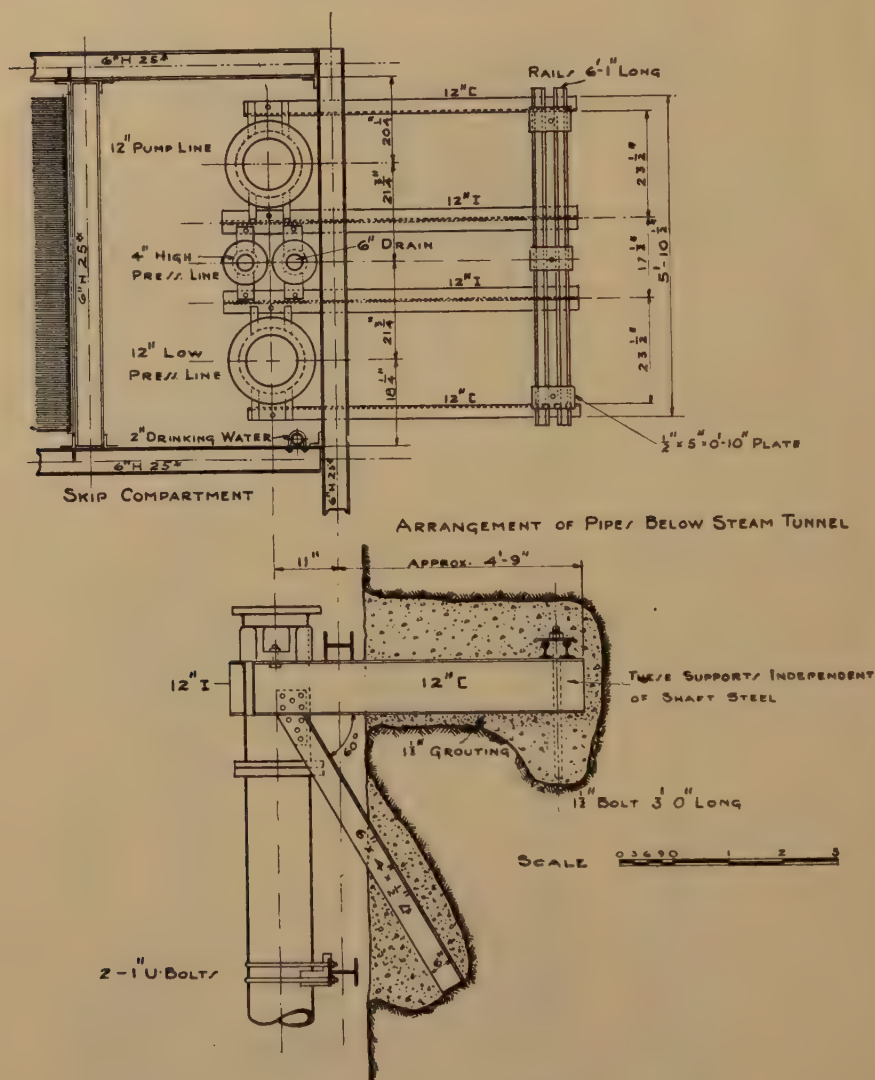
DETAILS OF PIPE SUPPORTS IN SHAFT.
